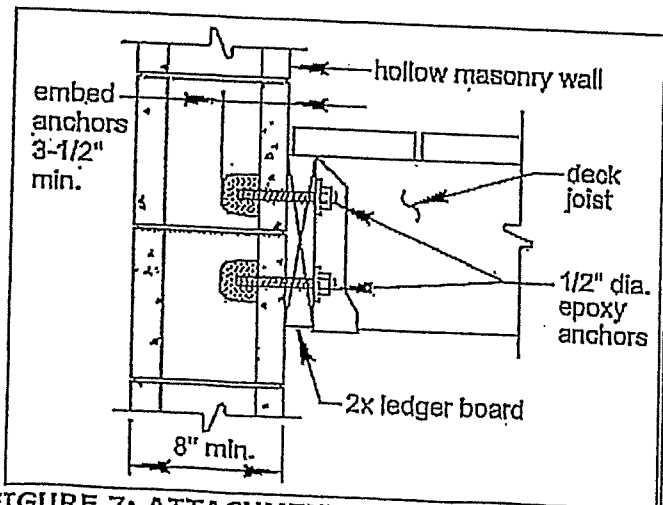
ATTACHMENT OF LEDGER BOARD-TO-FOUNDATION WALL (HOLLOW MASONRY)
